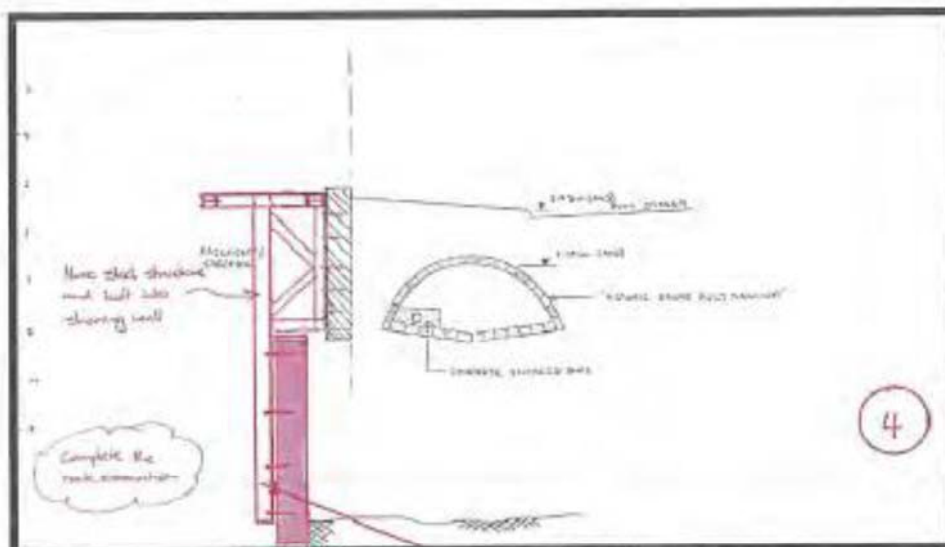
Northrop Engineering plan showing the Tank Stream in relation to the site for 19-31 Pitt Street. This will maintain the existing basement boundary. Rappoport 2010: 70.
